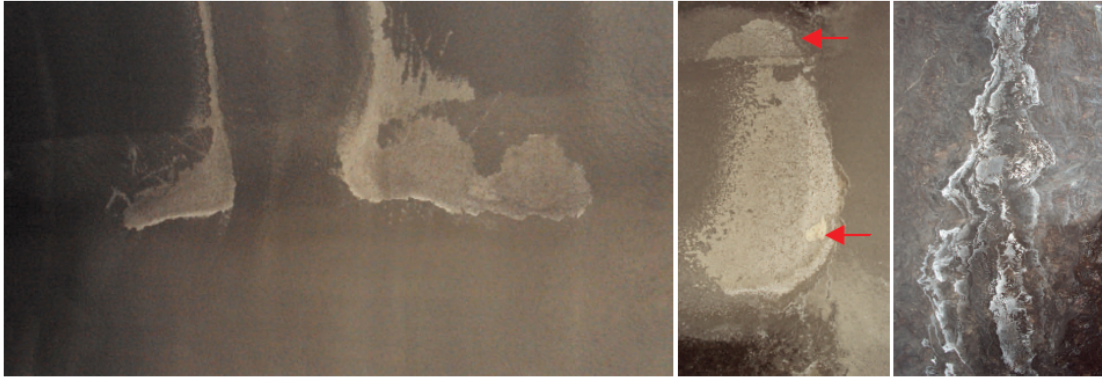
Left: Well developed spalling in the 1988 sprayed concrete, terminating about 1 m above the road. Apparently the wider lower spalls had also developed in the upper parts of the 2002 sprayed layers. Middle: Severe spalling in 1988 and 2002 sprayed concrete, being typically developed within the perlite layer: Previous spalling in 1988 perlite concrete (upper arrow) is partly covered by 2002 sprayed concrete, displaying extensive and more recent spalling with exposed PE-foam panel (lower arrow) Right: Bright white thermonatrite efflorescence deposited from ground water on rhomb porphyry rock mass (widths of photos; about 3 m; 1 m & 0.8 m, respectively).
